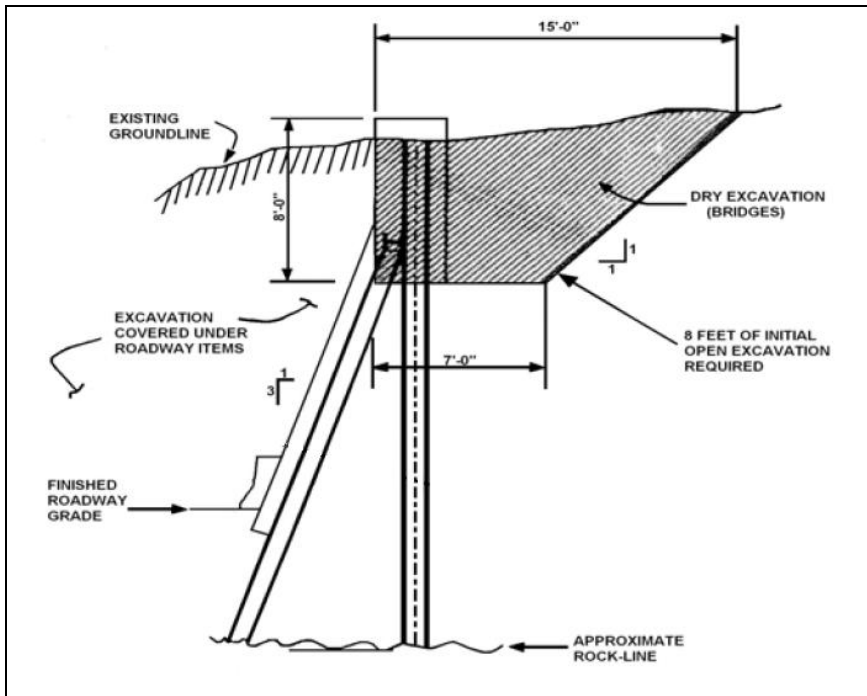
TDOT Specified Limits of Excavation (Pate and Haddad, 2007)
